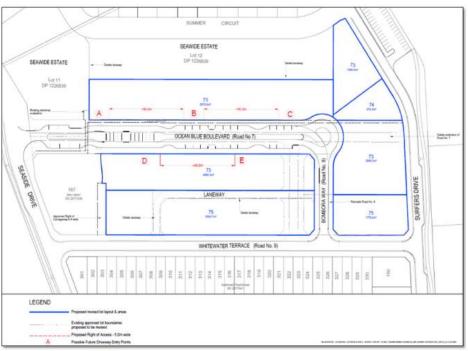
Originally proposed Plan submitted with Modification Application - detailing changes to the laneway
